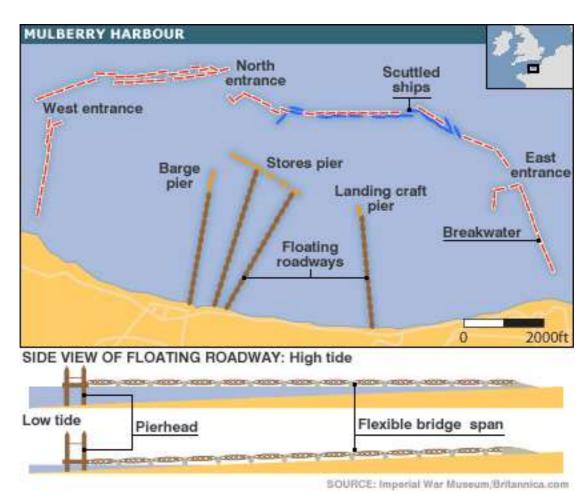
Plan view of the Mulberry Harbour at Arromanches, with a side view demonstrating the rise and fall of the roadway and pierhead due to the tide, which amounted to approximately 6 metres. Concrete Beetles were used only where the water was deep enough that they would always be afloat, otherwise steel Beetles were used. Imperial War Museum website
